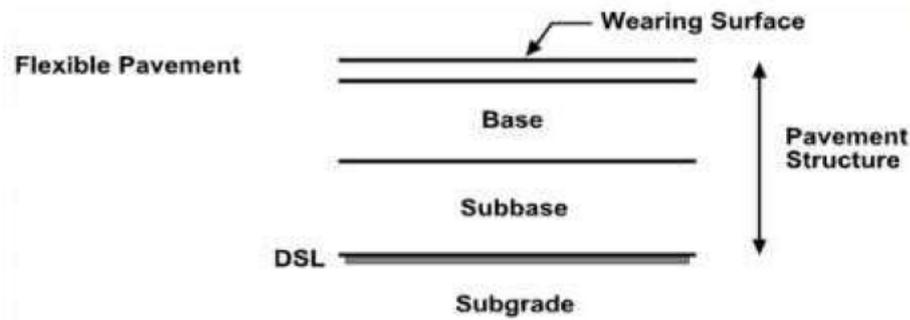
Components of flexible road pavement structure (Source: Austroads 2023)
